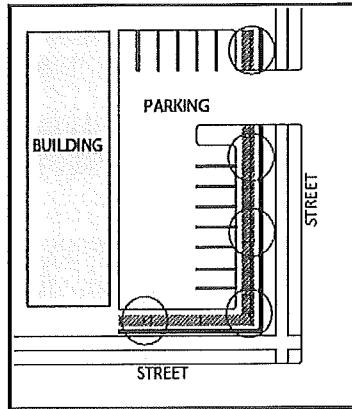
Landscaping Buffer with Evergreen Plantings—Plan View
